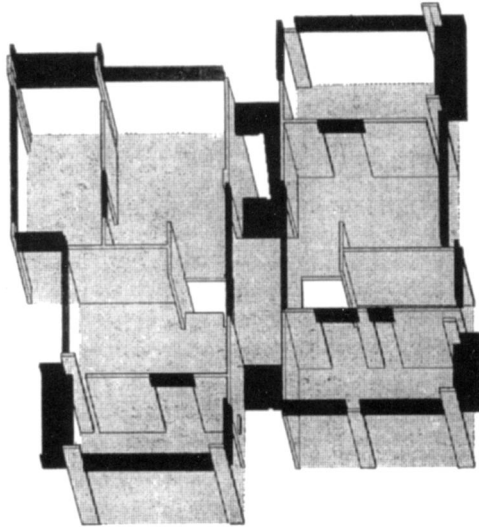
A later example of slab, wall-strip & beam construction by Arup: in situ cast slabs and strips shown in grey, pre-cast elements in black (Cleeve Barr 1958 fig. 73.)
